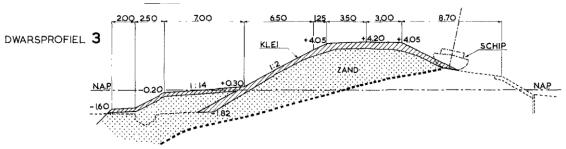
Cross section of the 'old' and reinforced IJssel dike (Rijkswaterstaat & KNMI, 1961)
